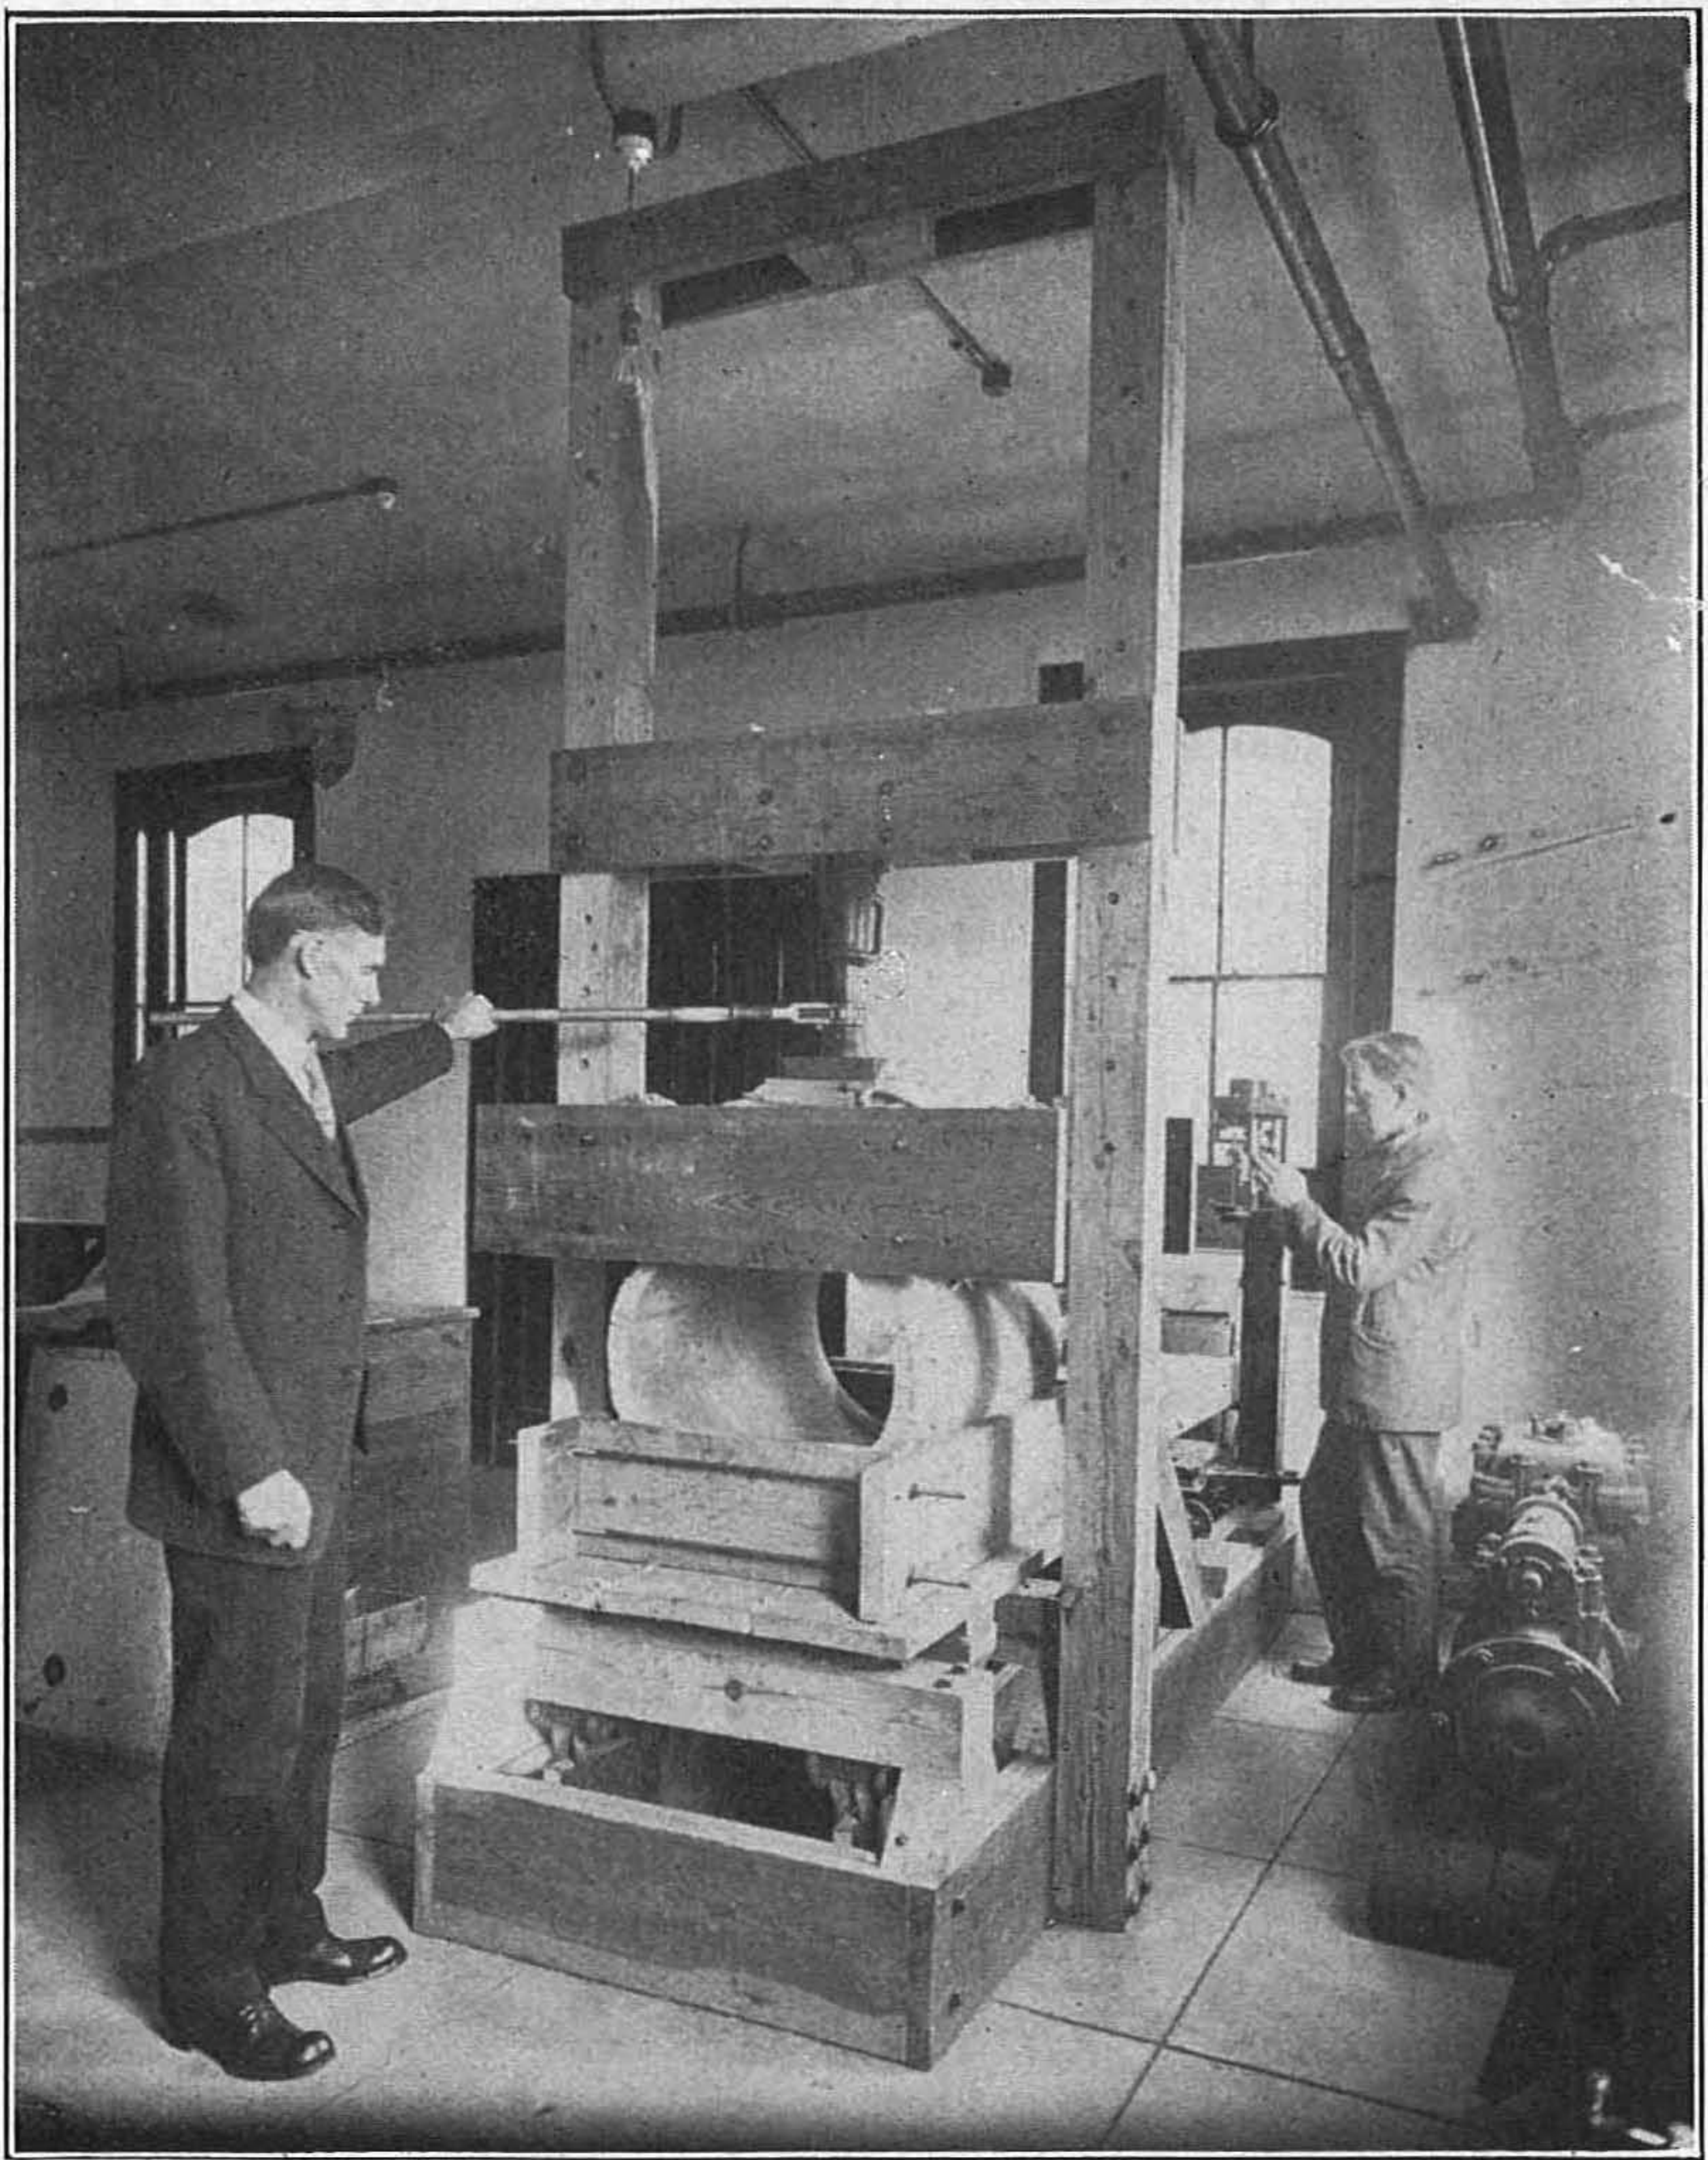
Testing a 36 Inch Drain Tile with Ames Standard Homemade Testing Machine.
